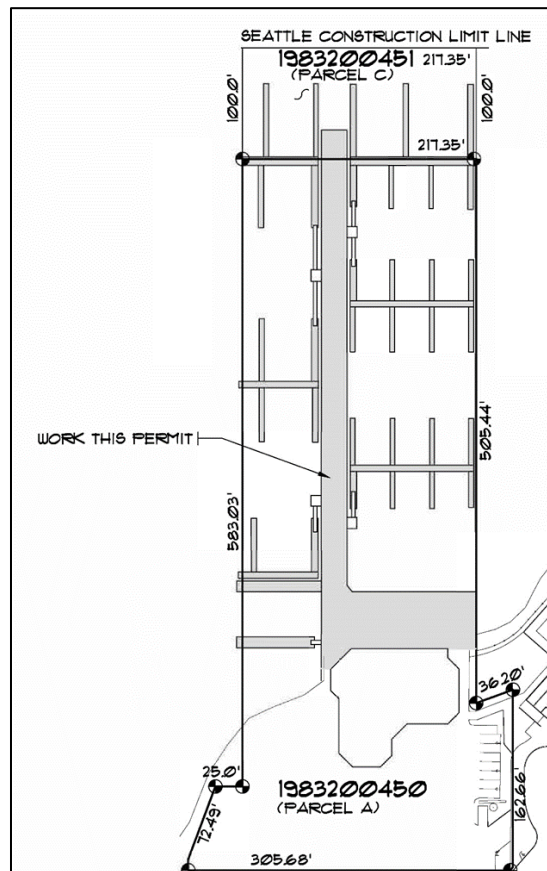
General diagram of HC Henry Pier structures [taken from provided design plans (Pacific Engineering Technologies, Inc. 2021b)]
